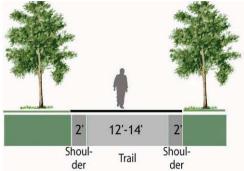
Section 2.2b Improvements to Existing Greenway Trail
